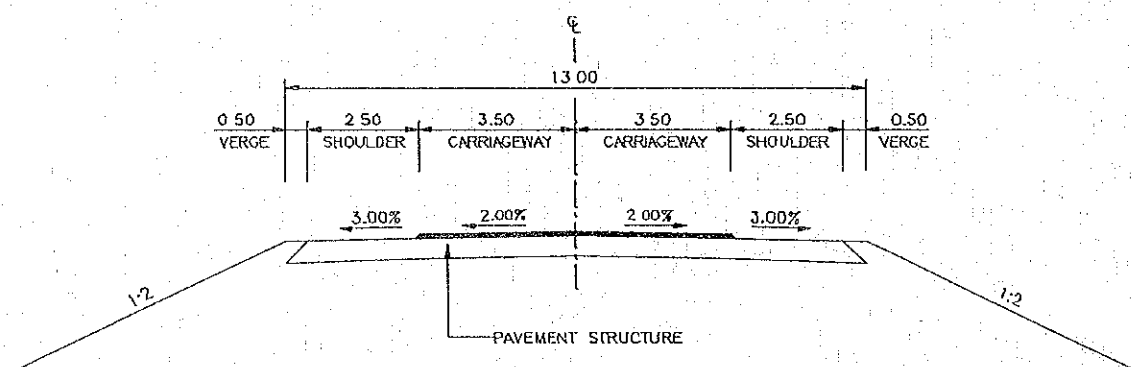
Typical Cross-section of the Connecting Road on the Lao PDR
